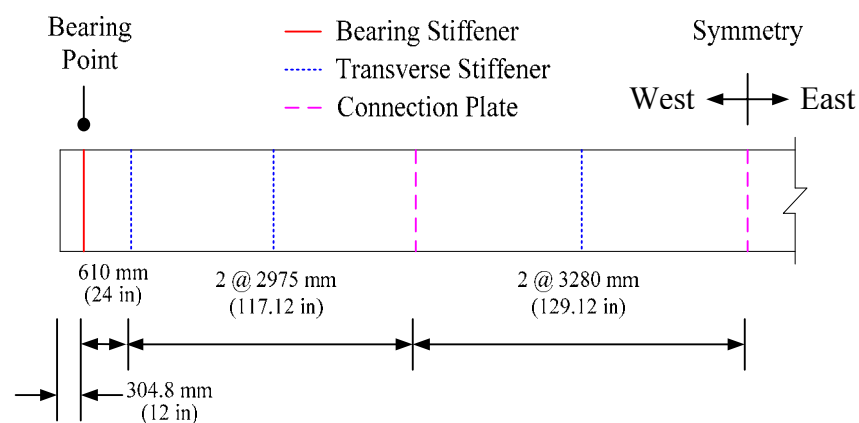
G1 – location layout for bearing stiffeners, transverse stiffeners and connection plates.
